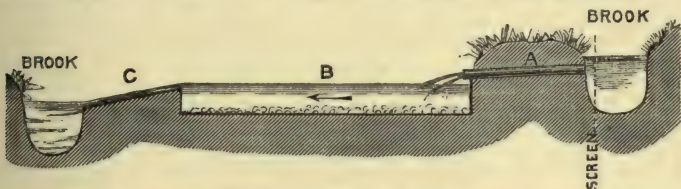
SIMPLE ARRANGEMENT FOR TROUT BREEDING (Section).
